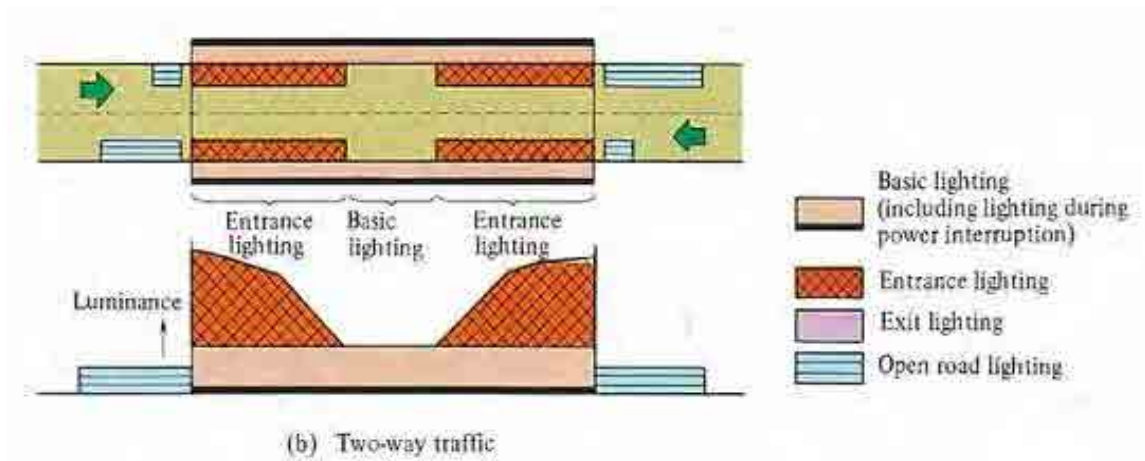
BASIC SCHEMATIC TUNNEL LIGHTING PLAN
